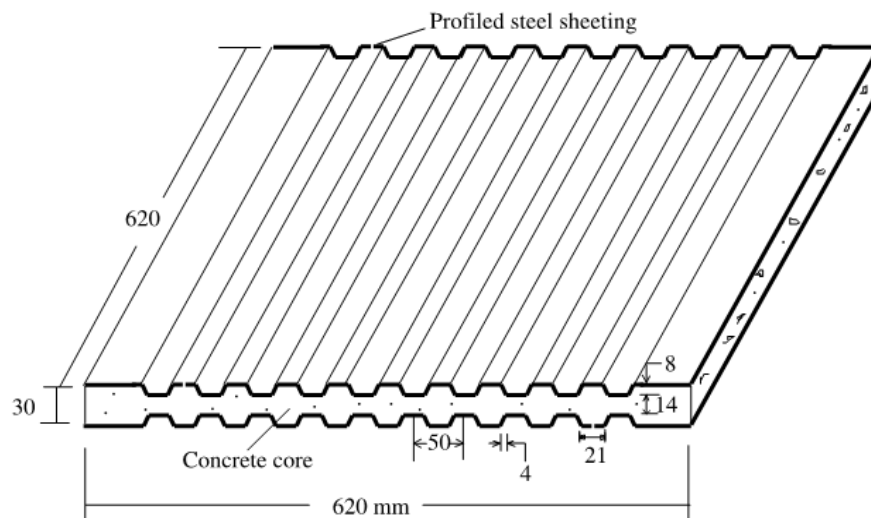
Detail of composite wall, profiled steel sheeting and concrete core tested by Hossain and Wright (2004b)
